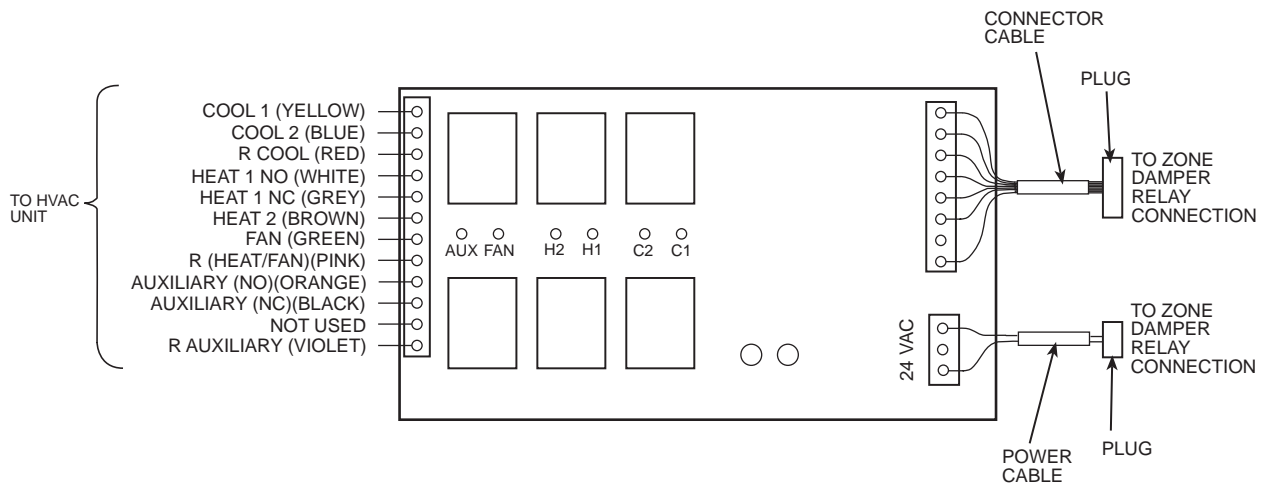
Relay Pack Installed in Damper Actuator Cover
